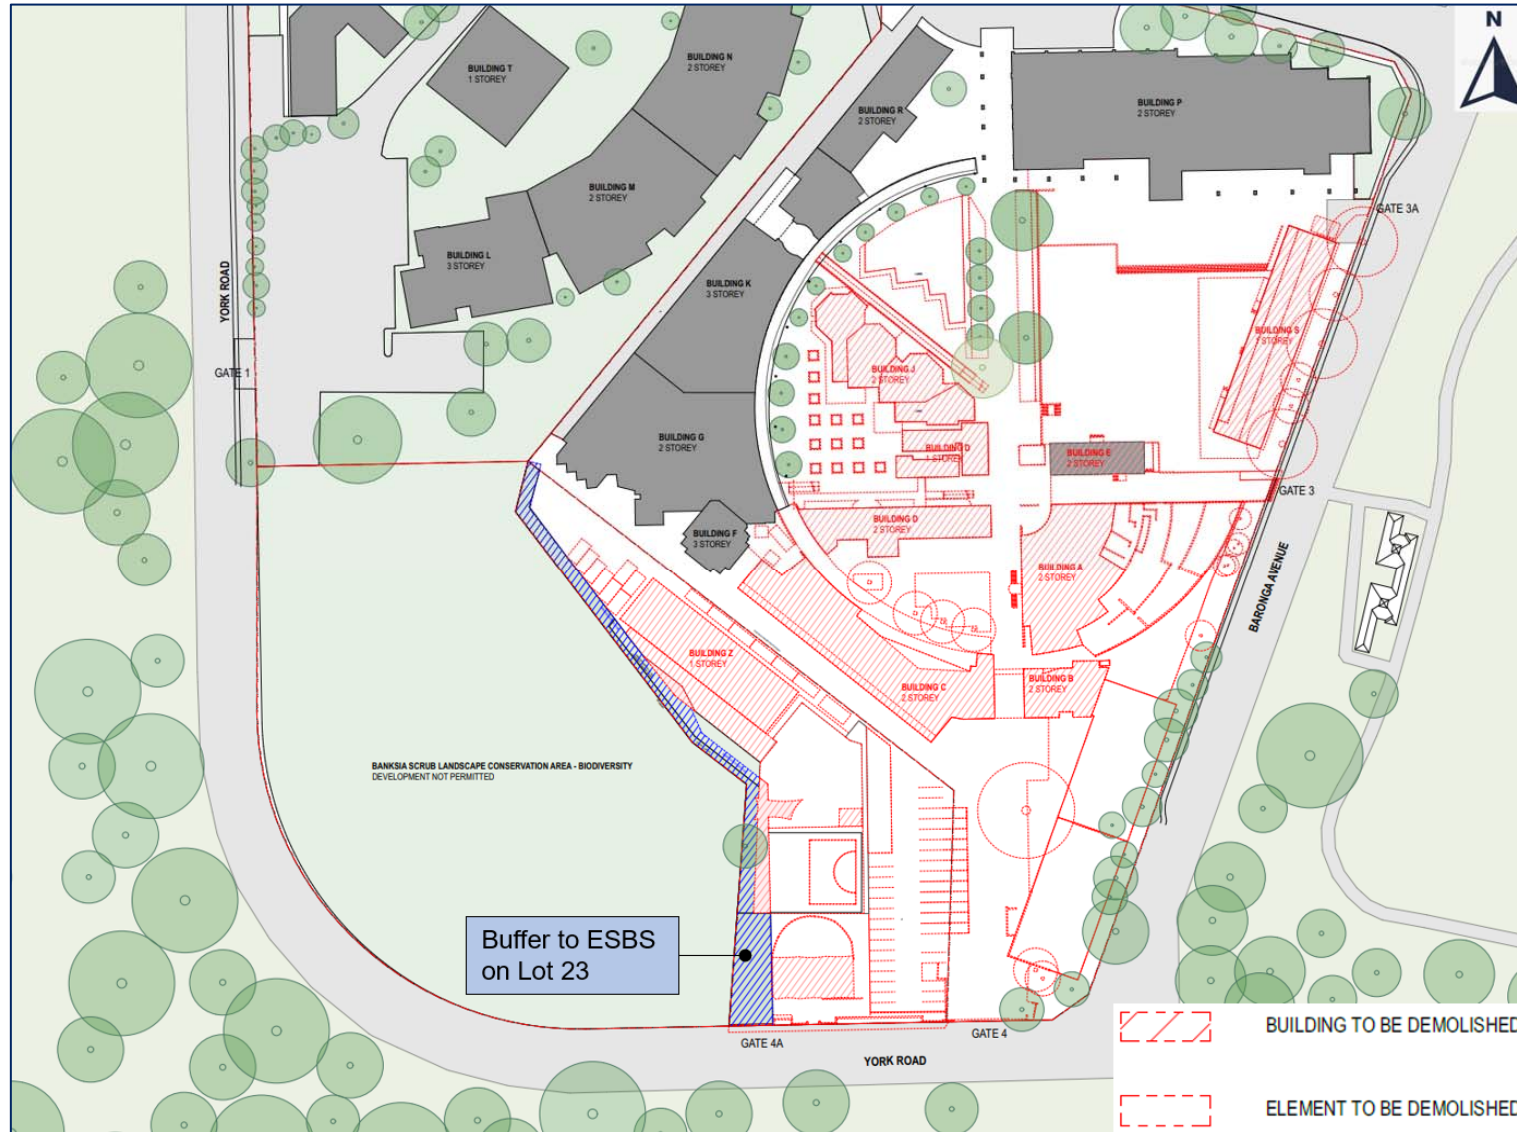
| Concept demolition plan (Base source: Applicant's SRtS)
